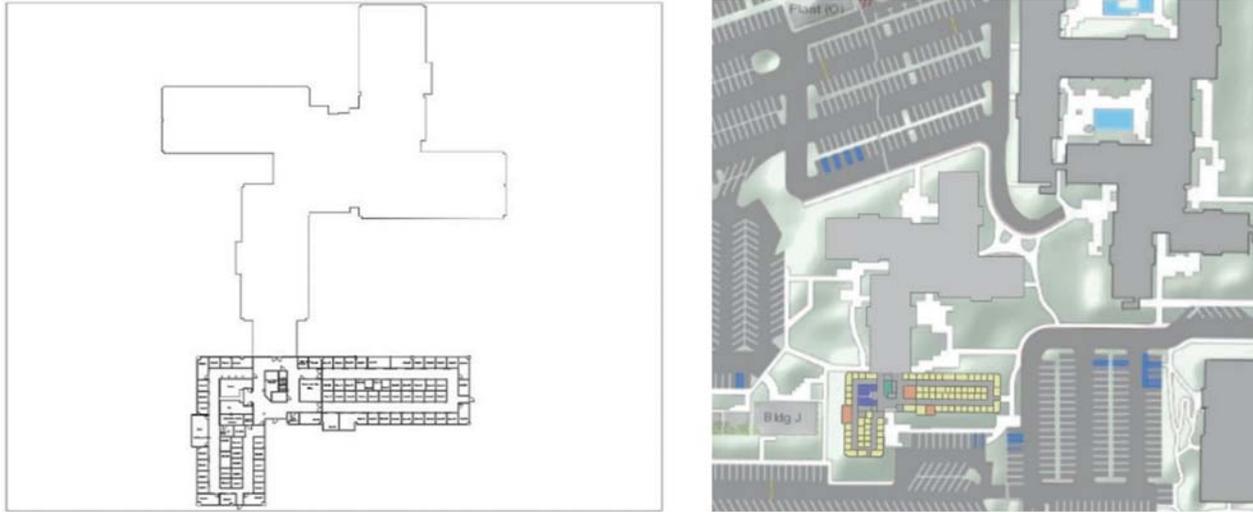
Architectural plans of a part of OOA building. The details of each step using Campus Viewer Tool are discussed in the following section
